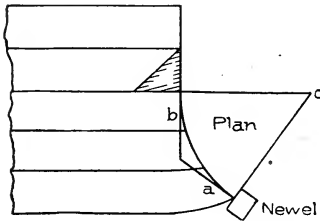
Bottom Steps with Obtuse-Angle Plan.
